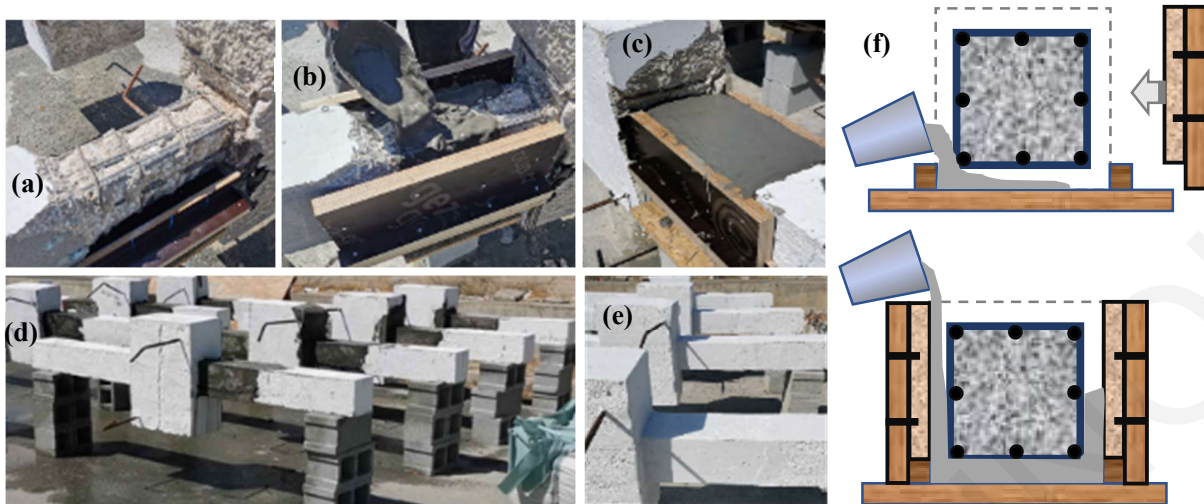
6: A modular form is used to cast the jacket: (a) lower cover cast from the side; (b) Side forms are placed for casting of the sides; (c) Leveling of top cover; (d) After formwork removal; (e) retrofitted specimens ready for testing; (f) Sectional detail of the modular form.
